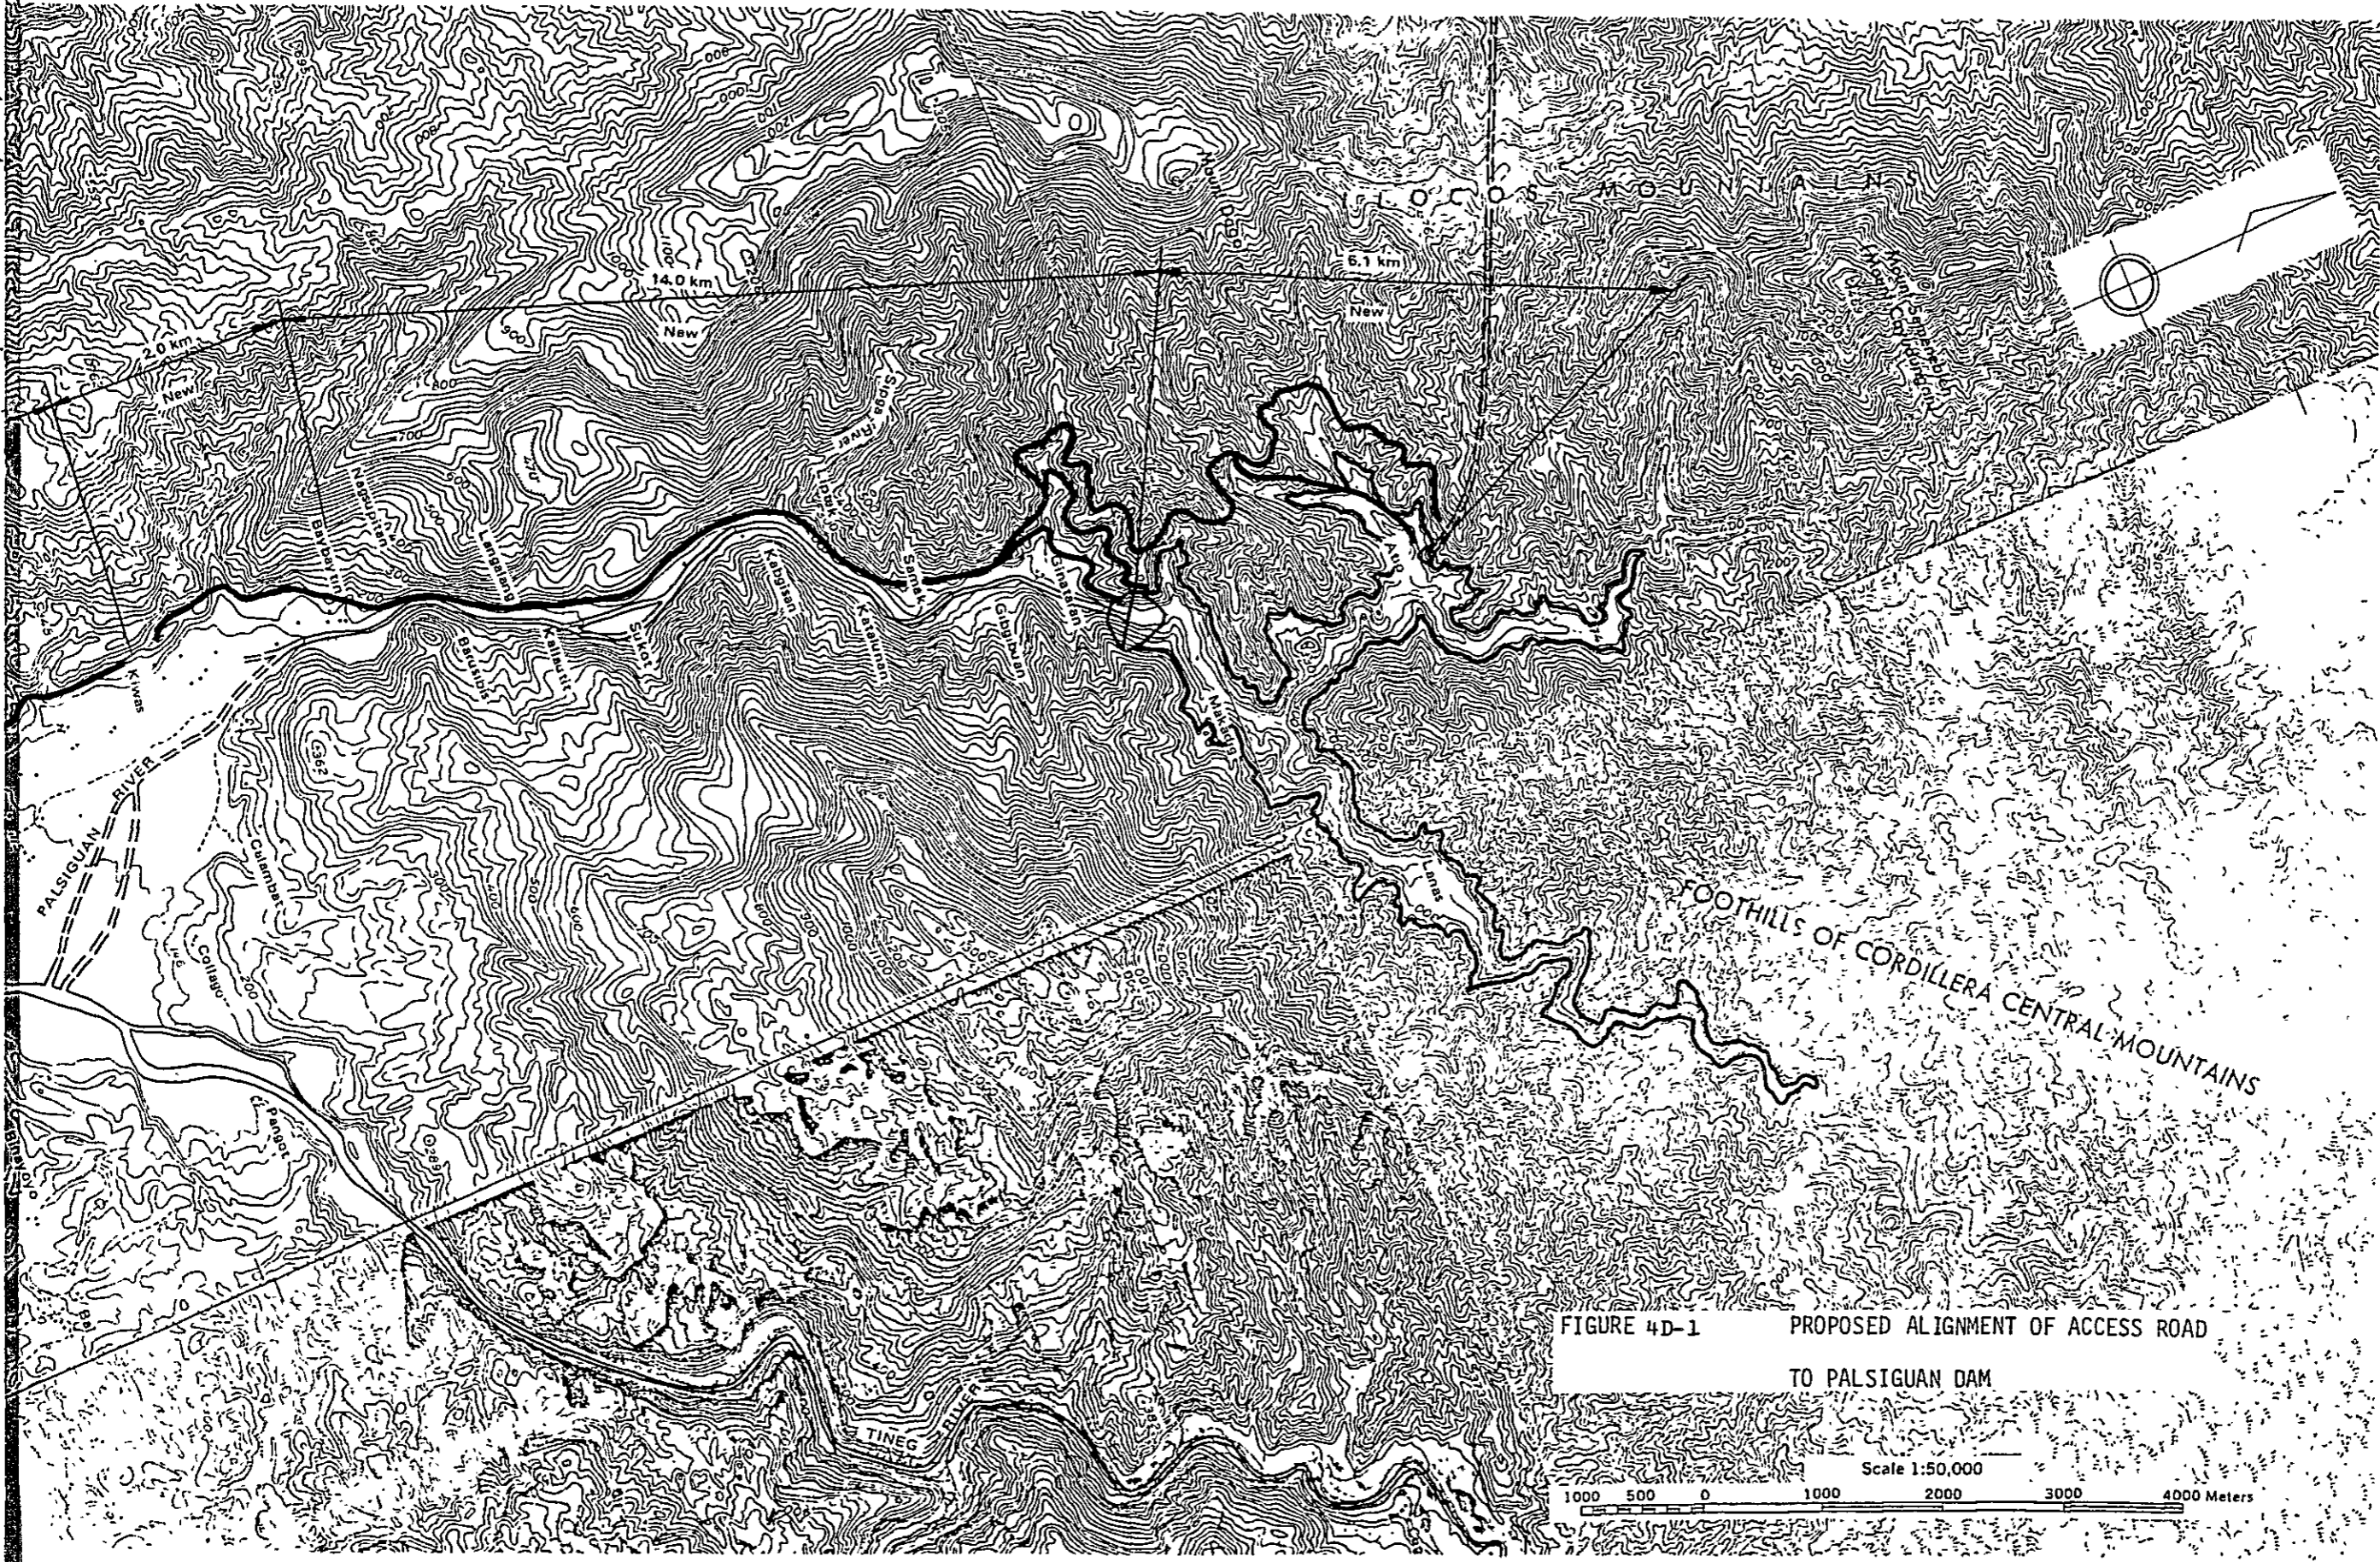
D-1 PROPOSED ALIGNMENT OF ACCESS ROAD TO PALSIGUAN DAM
